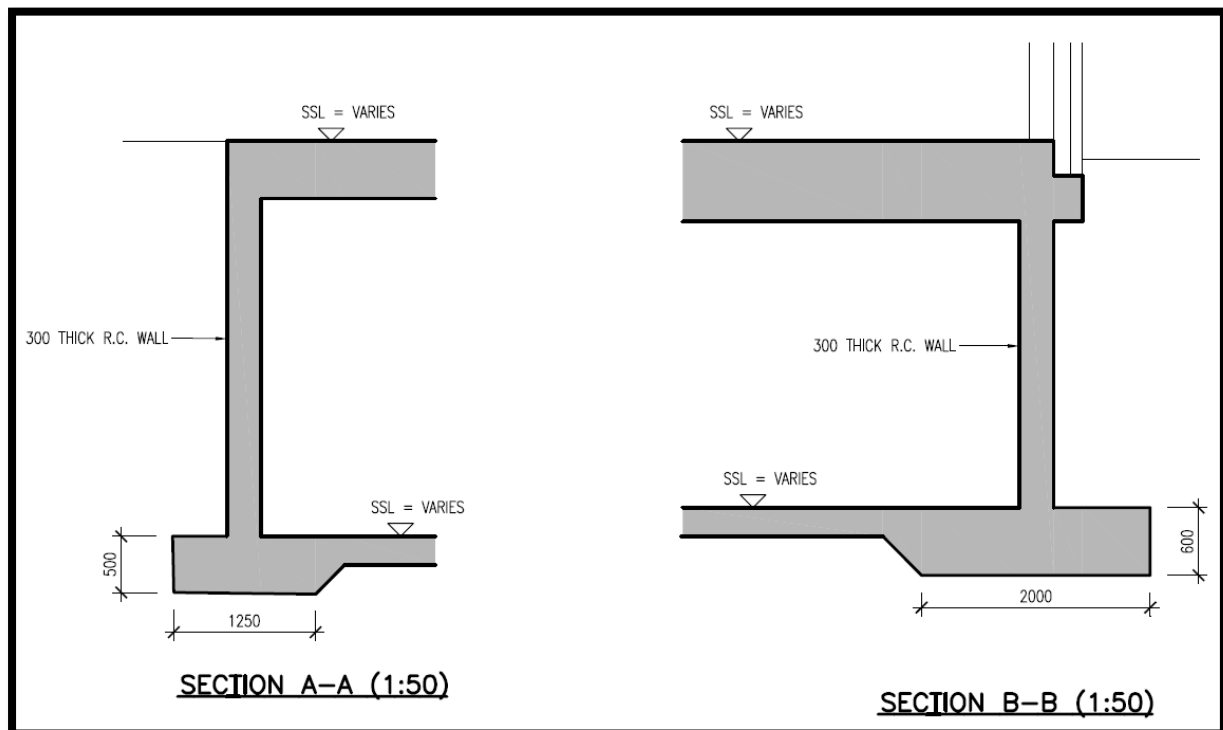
Sample section through basement external boundary at podium and external wall in permanent condition.
